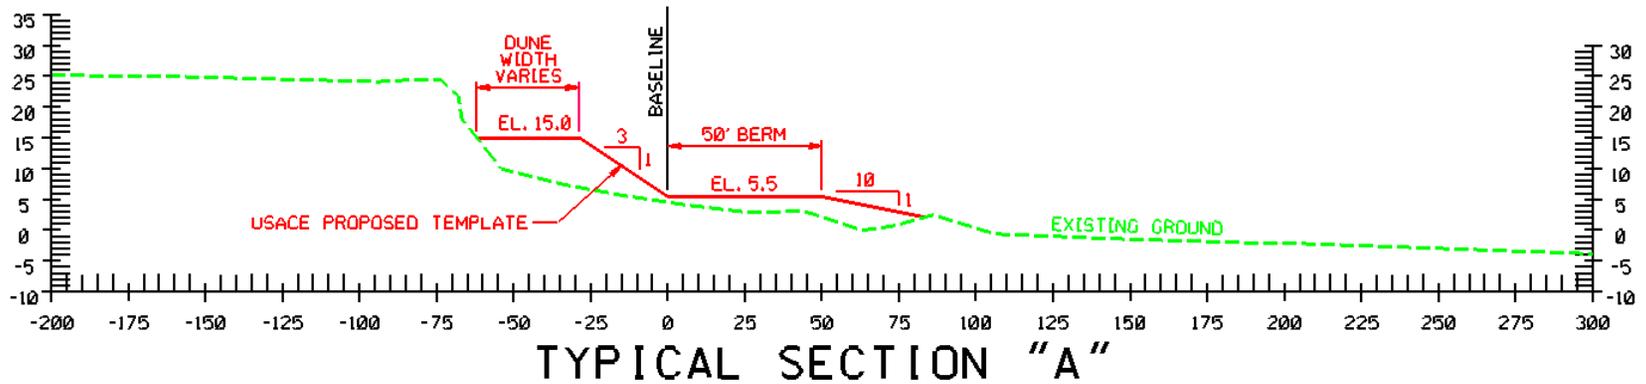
TYPICAL PROJECT SECTIONS TO BE CONSTRUCTED
